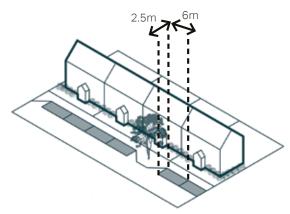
Illustrative diagram showing an indicative layout of on-street parking
